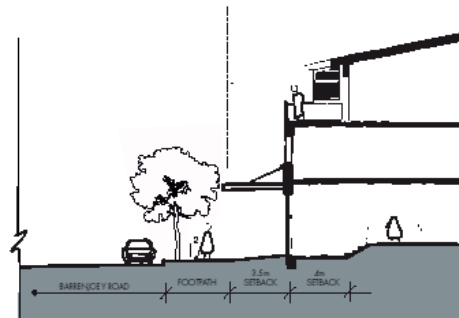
Barrenjoey Road: Ground and first floor building 3.5m setback building line
